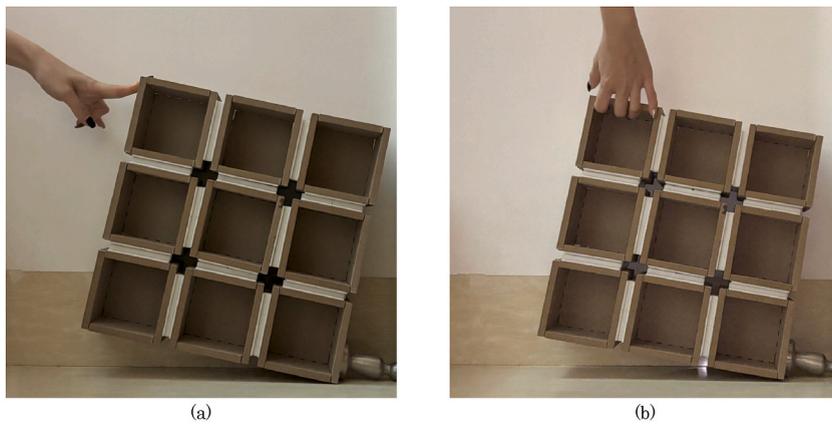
Interlocking connection-reinforced timber modules under (a) lateral and (b) vertical load.
